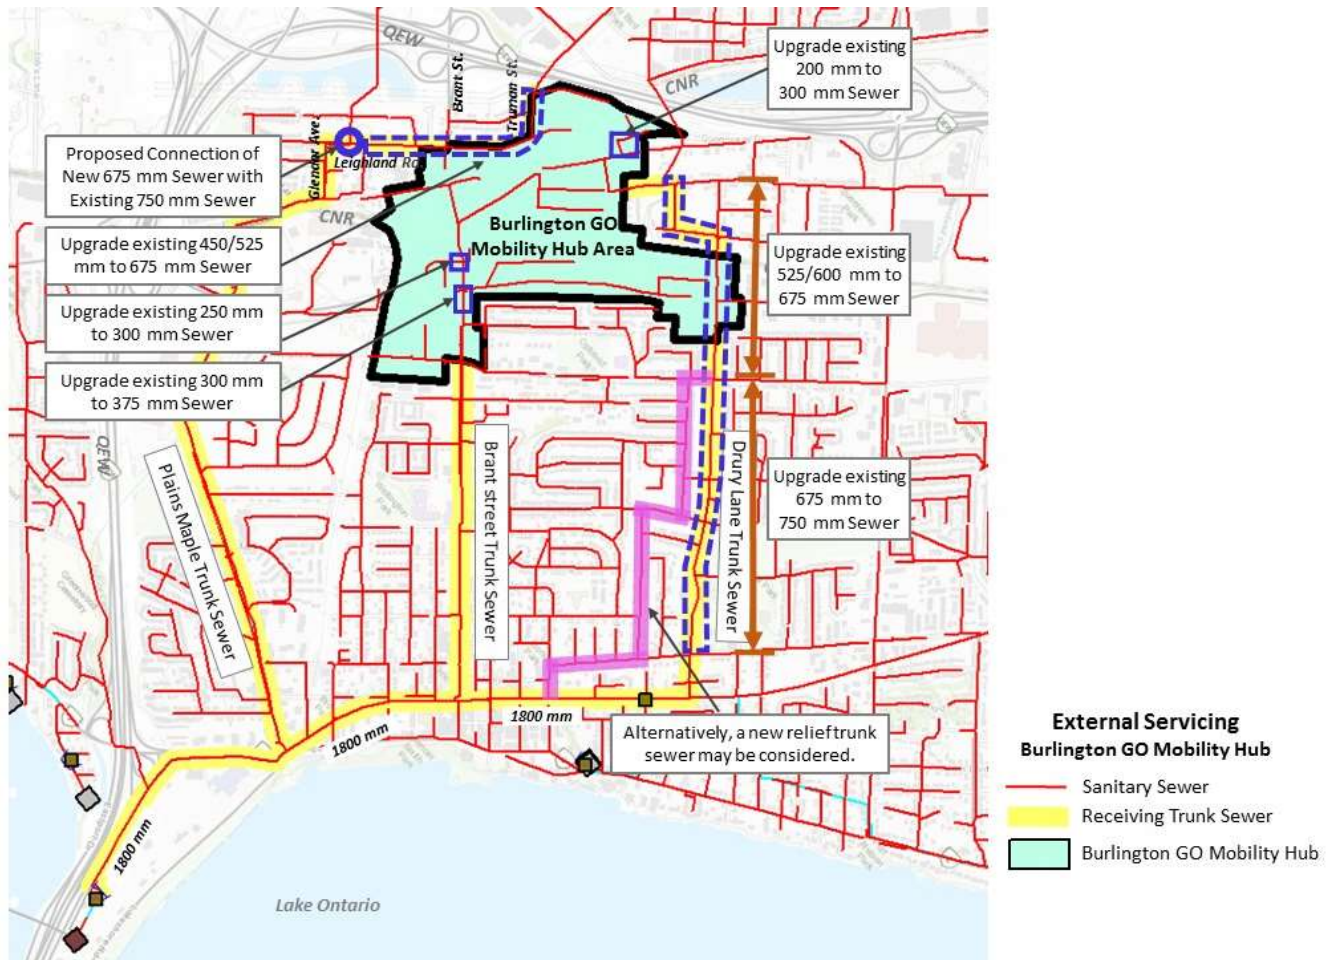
Proposed External Sewer Improvements - Burlington Go MTSAs
